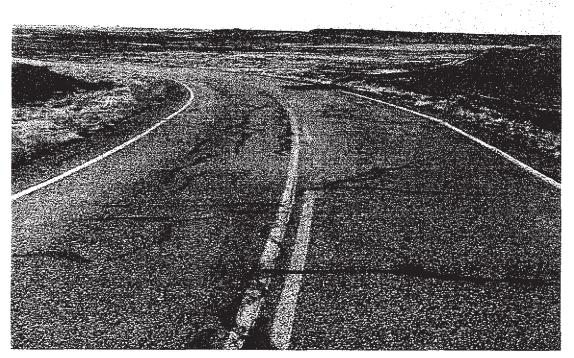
MP 25.40 - Typical Pavement Section, Note Longitudinal and Transverse Sealed Cracks
